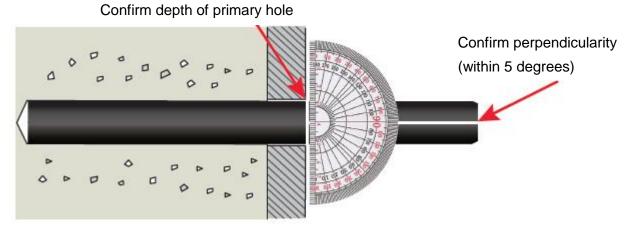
Confirming depth and perpendicularity of primary hole (Through-fastening type)
